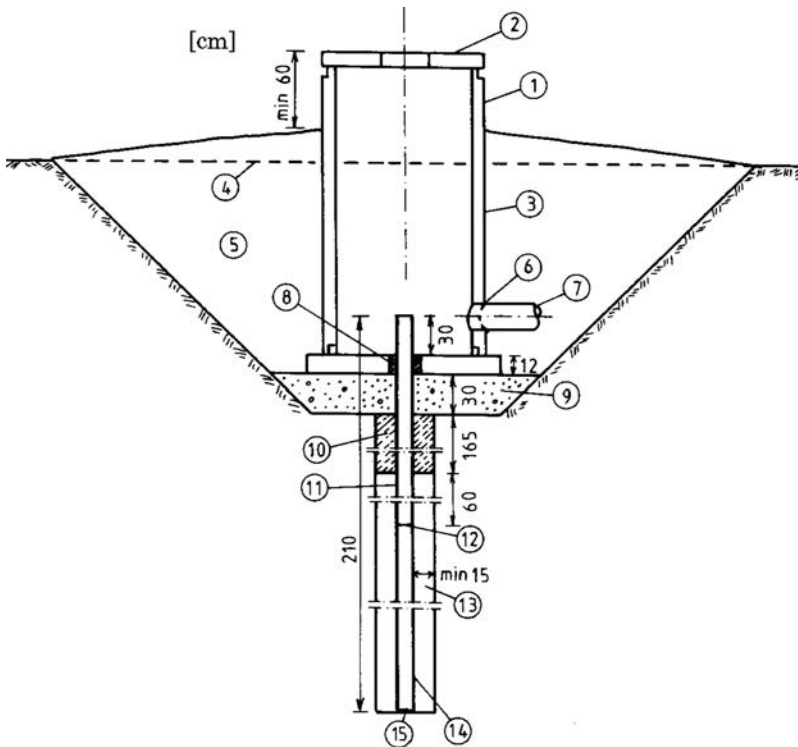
Pressure-relief well with steel pipe and inspection well (after USBR, 1977a). (1) Inspection well; (2) cover; (3) pre-cast concrete; (4) existing ground surface; (5) back fill; (6) rubberized sealing compound; (7) outflow pipe (2% slope); (8) rubberized sealing compound; (9) sand and gravel; (10) clay and silt seal; (11) steel riser pipe; (12) top of well screen; (13) pack material; (14) stainless steel well screen 10 cm; (15) plug.
